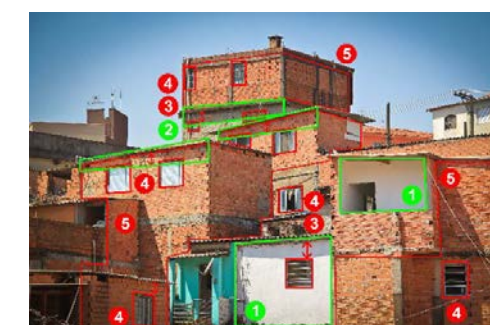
Multi-story residential building cluster in the Favela of Rocinha, Rio de Janeiro, showing a sequence of flat metal roofs, primarily bare brick walls and standardized aluminum windows.
